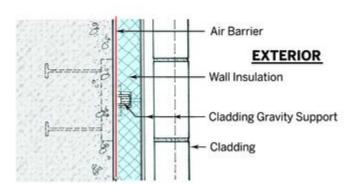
(EN35) Wall Masonry Attachment – Cladding Gravity Support
